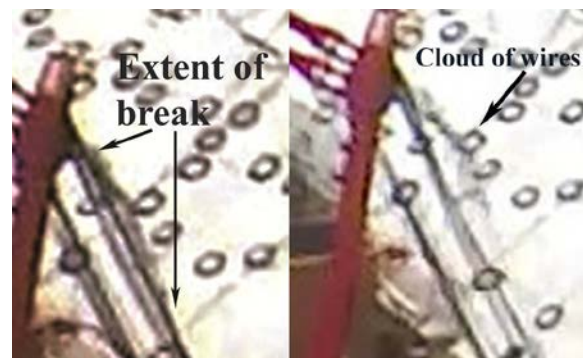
Wire rope failure location in the lattice boom crawler crane.
